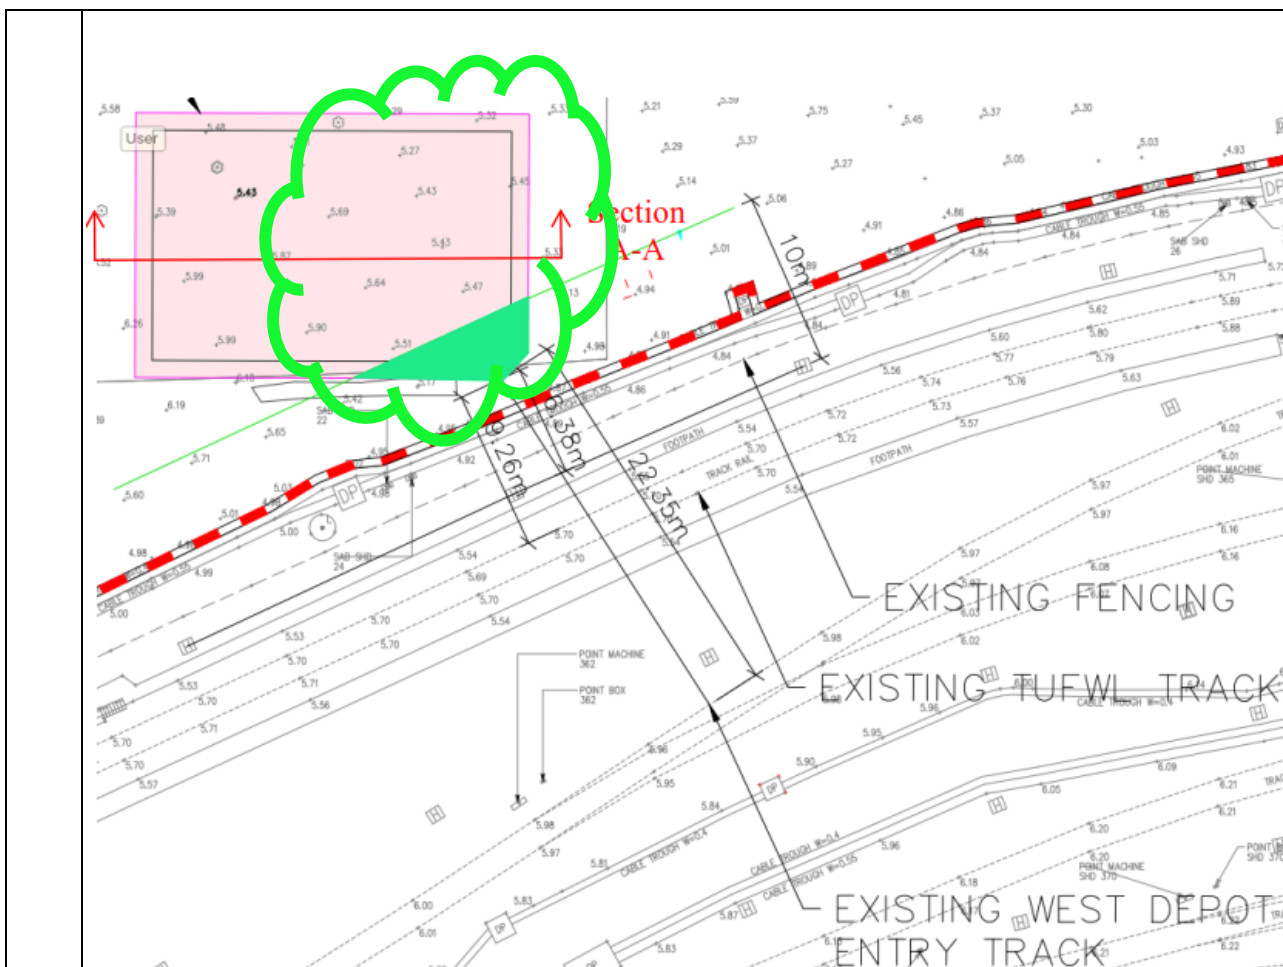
Plan View of ELS at Temporary Underfloor Wheel Lathe and the Existing facilities in BIM Model
